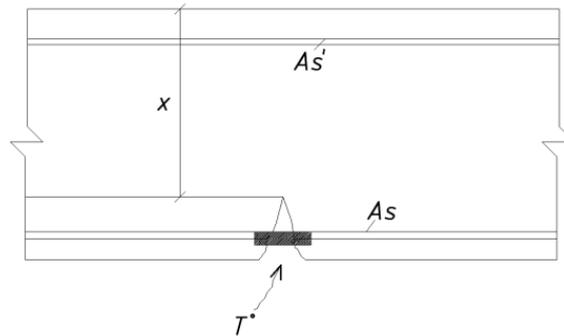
Fire damage of joints of connection of reinforcing bars.
